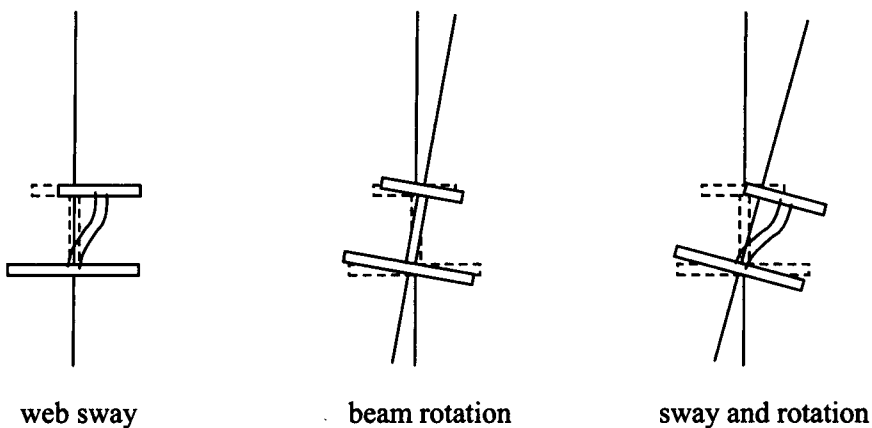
Instabilities to be avoided in beams at top and bottom of columns
